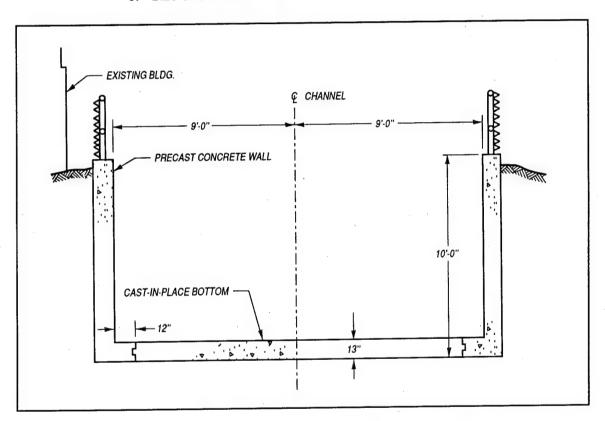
Typical channel repair section, Placer Creek (after Hacker 1986)
